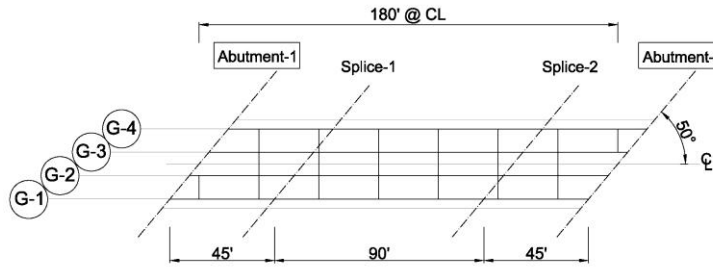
Simplified Framing Plan of Bridge S2: Single-Span, 50° Skew.
